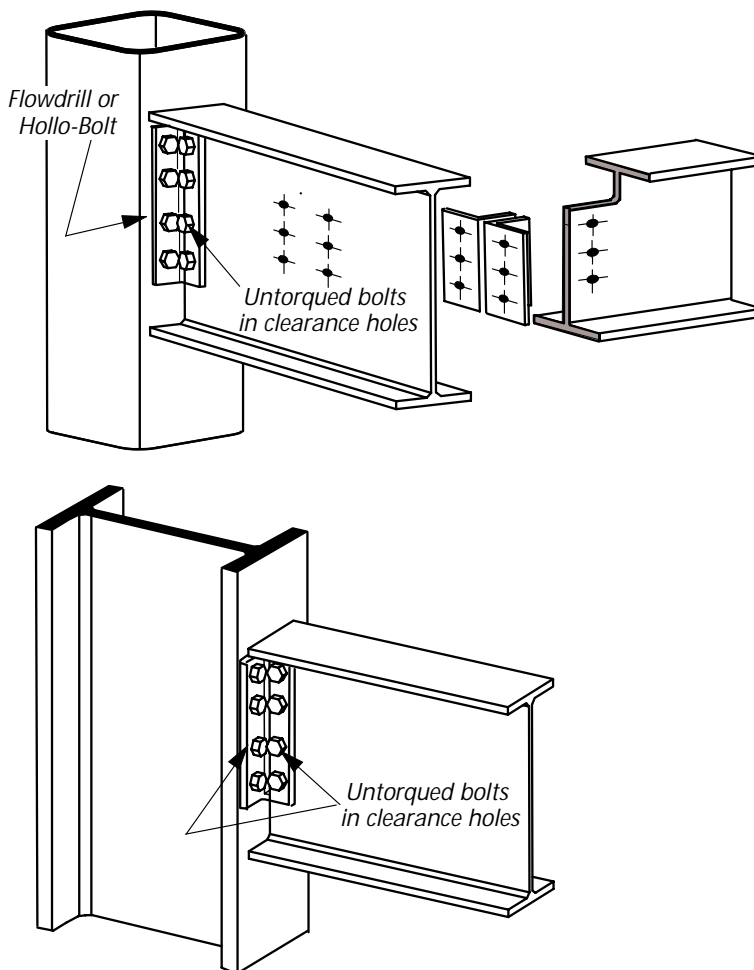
Double angle cleat. Beam-to-column and beam-to-beam connections
